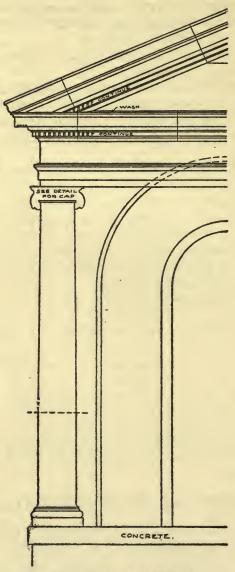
Elevation of a Porch. See also Figs. 22 and 23.
